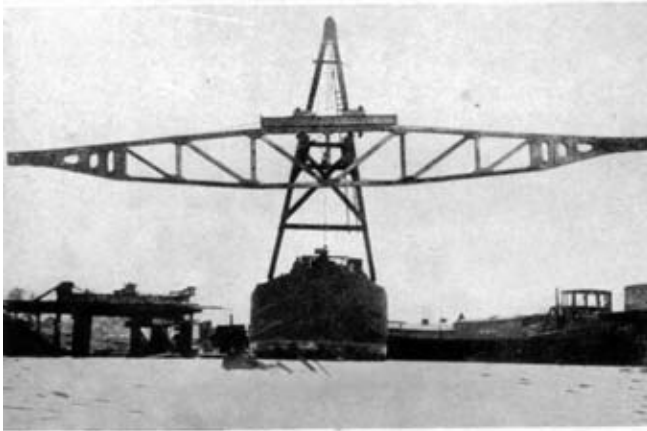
Floating sheer legs for erecting girders. Note. "Mulberry" girder lengthened at both ends.
